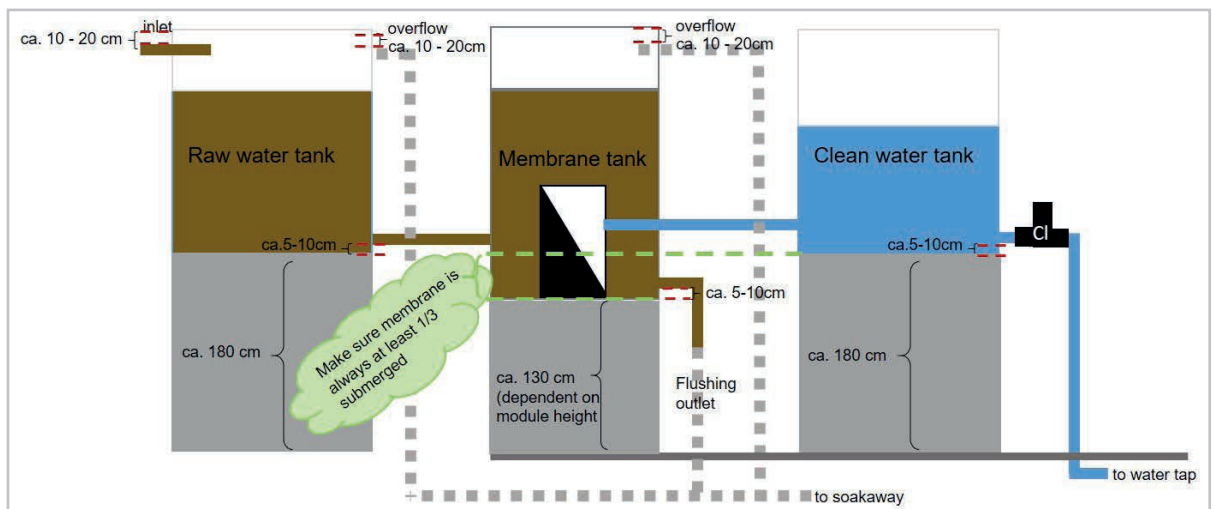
Drawing with the suggested position of pipe connections (horizontal three tank design)
